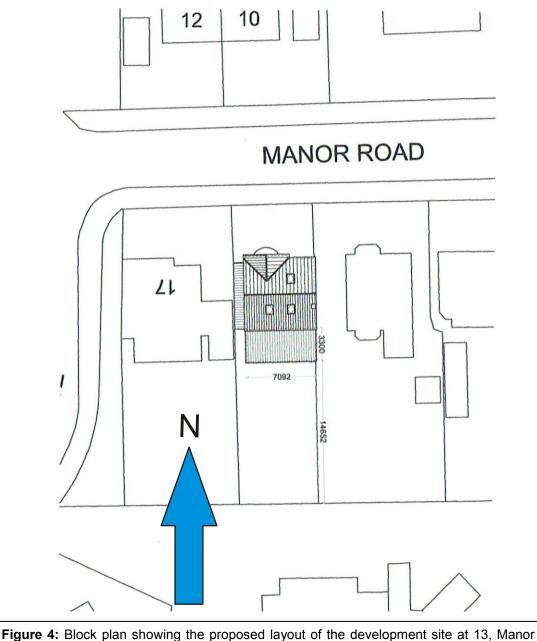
Block plan showing the proposed layout of the development site at 13, Manor Road at an original scale of 1:200, (not to scale), (extract from Architects plan).
